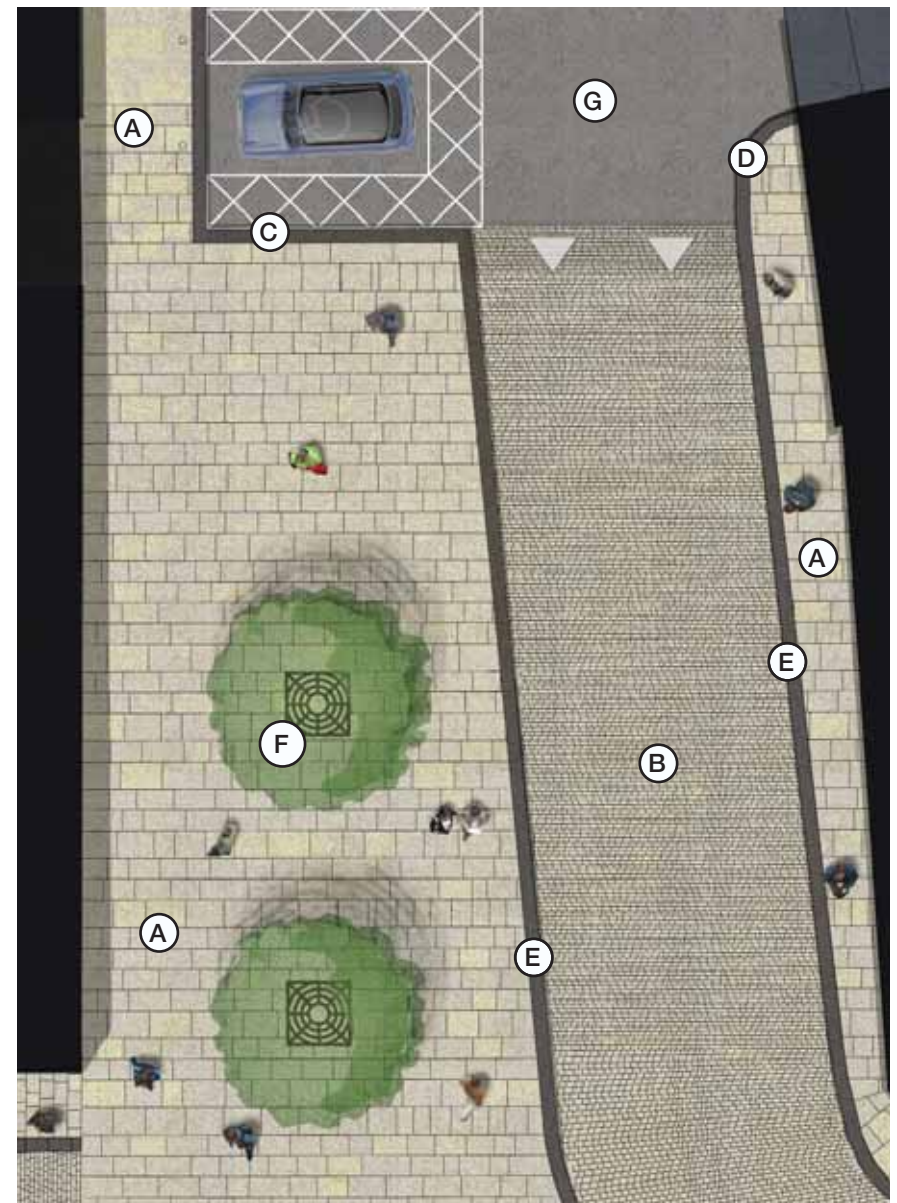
Concept sketch plan illustrating typical layout and materials of the street (Example Bull Plain)
